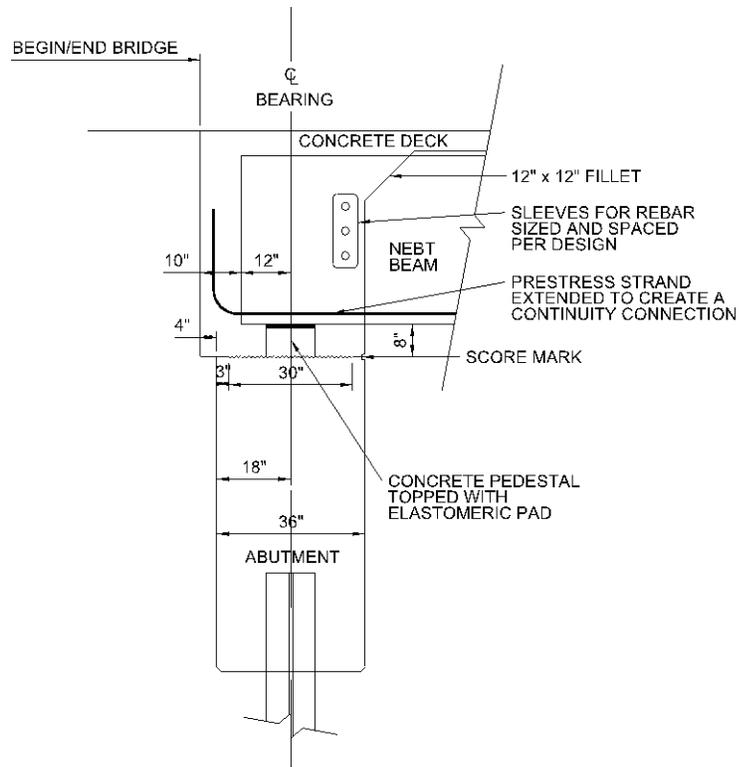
2 North East Bulb Tee (NEBT) Type B Bridge End Detail
